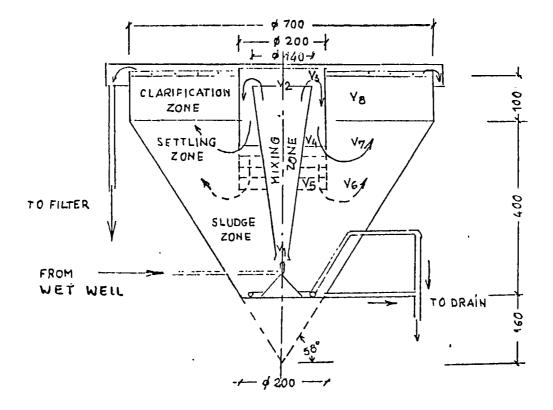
A typical cross section of the clarifier in the Awassa scheme (GWE, 1978).
